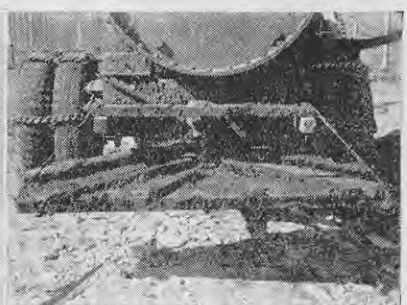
Rear end view showing simple home-made distributor board. This has proved highly efficient in practice.
